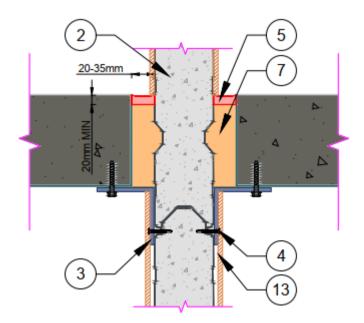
Dual wall system with vertical wall between horizontal walls – gap width of 20-35 mm between the stair and horizontally oriented wall
